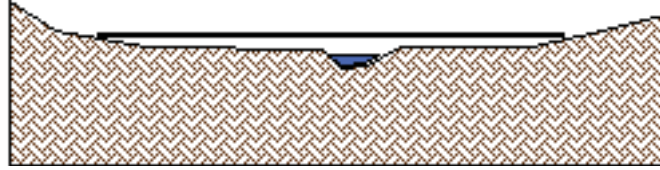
Center setback areas over the floodway with matching elevations at either boundary.
